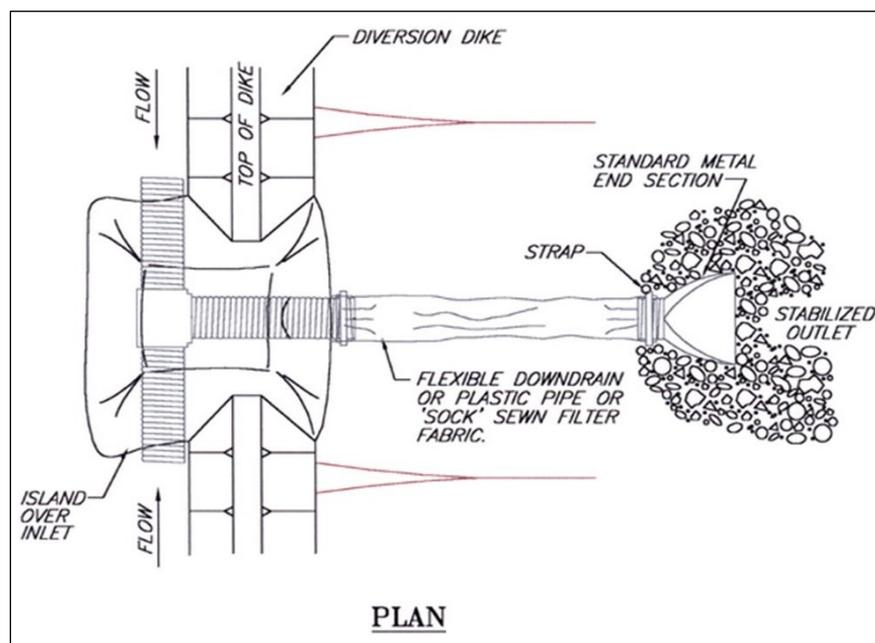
42: Slope Drain with Diversion Dike and Flexible Downdrain (Plan View)
